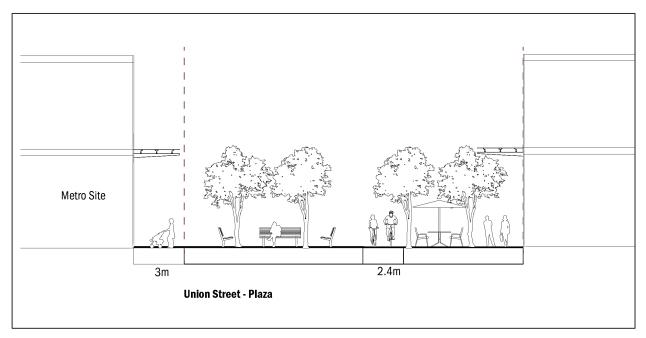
Street section 2: Union Street Plaza (Hassell)
